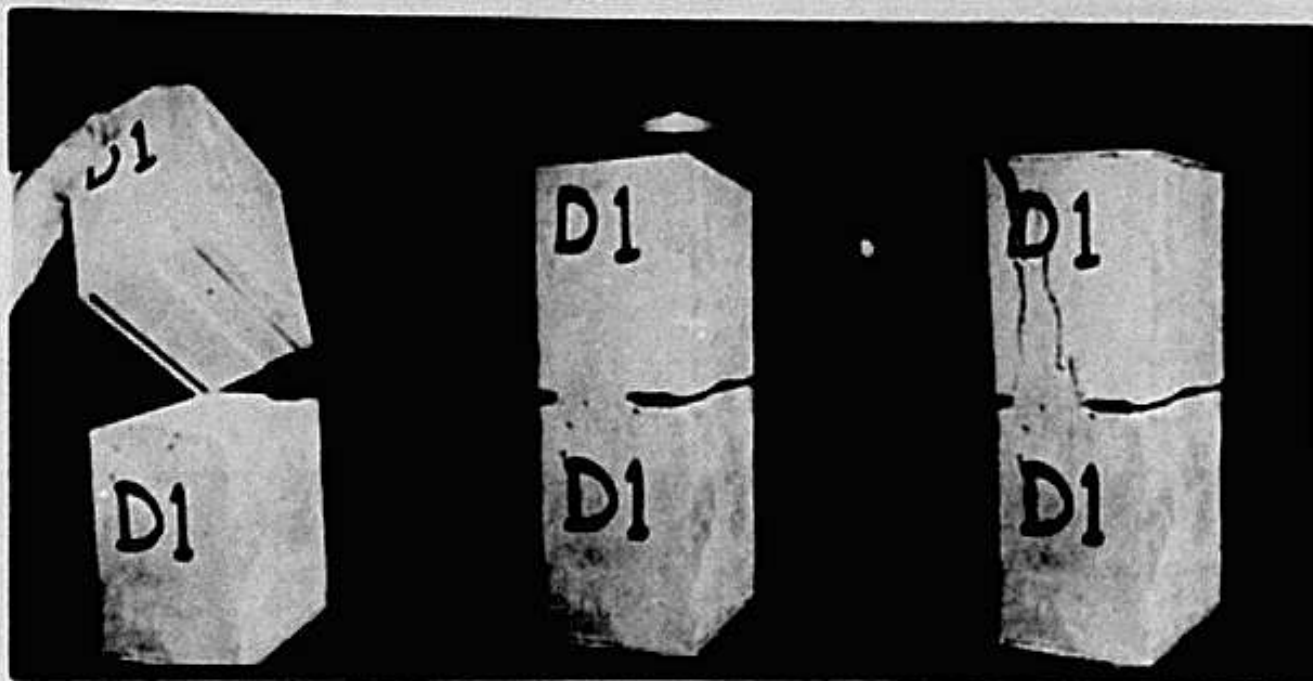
JOINT TESTS ON "D" SPECIMEN HAVING NO GASKET OR SEALANT, BALTIMORE TUNNEL CONFIGURATION
